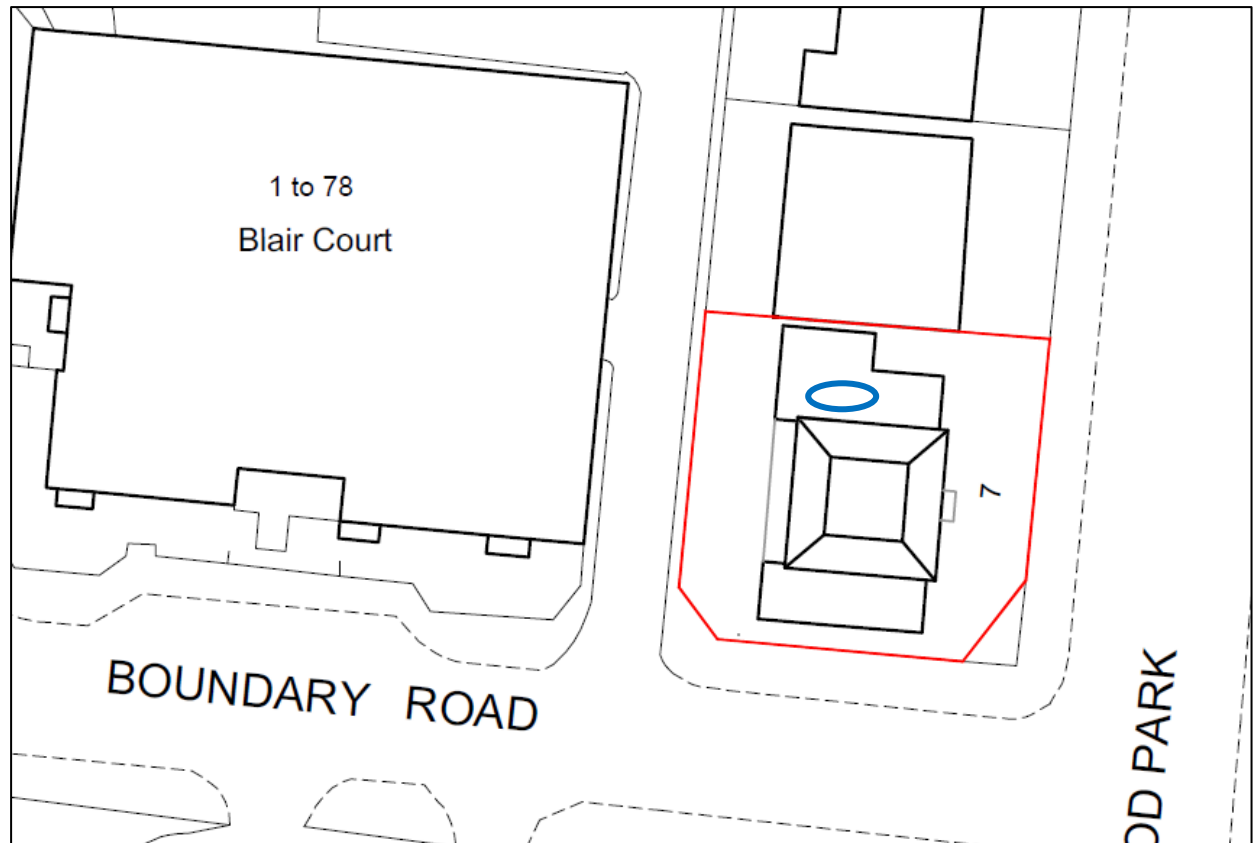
Plan showing the location of the residential (red boundary) and new mechanical services plant (blue outline)
